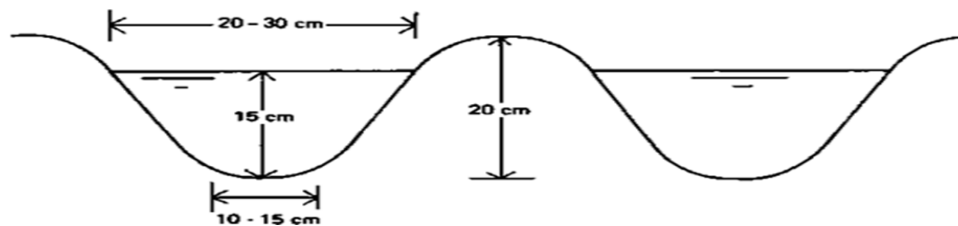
Cross-section of a small field drain showing typical dimensions for depth, width, and spacing between adjacent drains.
